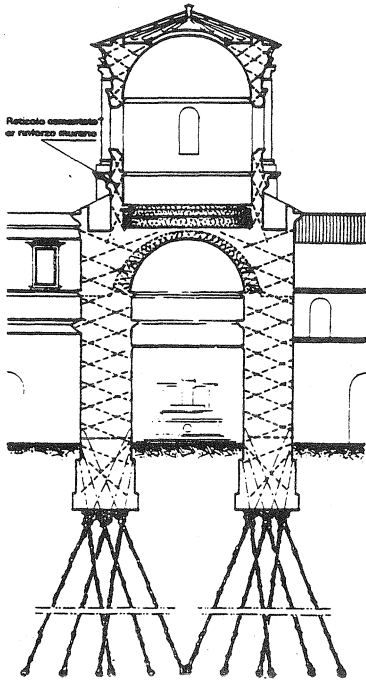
Heavy retrofit of masonry structures: the "reinforced truss".
